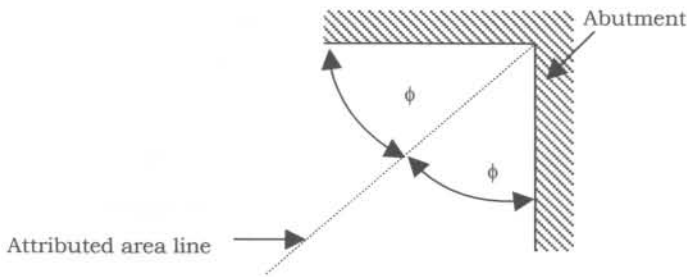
(f): Attributed line dividing the corner at an abutment in two
